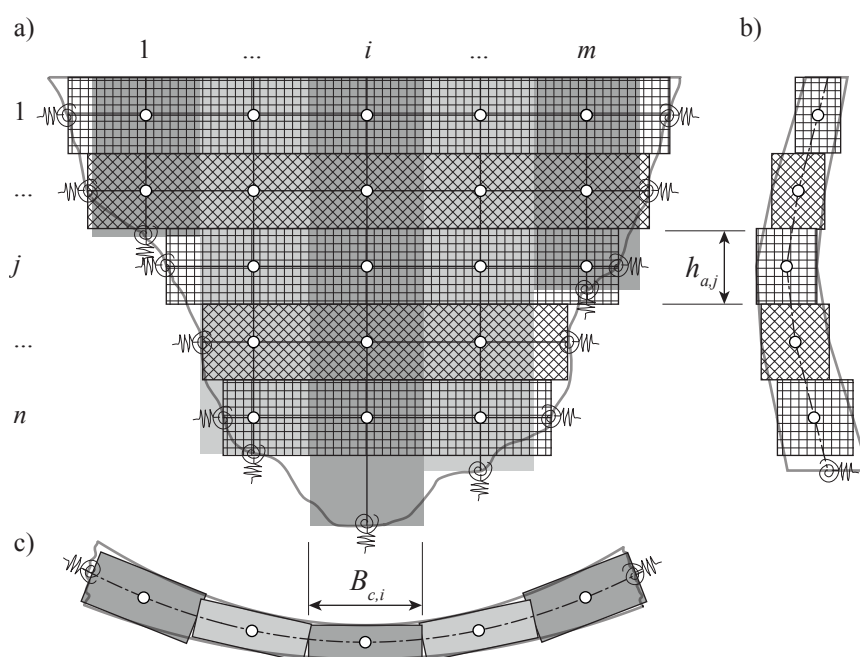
Discretisation of an arch dam in n arches and m cantilevers; a) frontal view; b) cross section; c) plan view.
